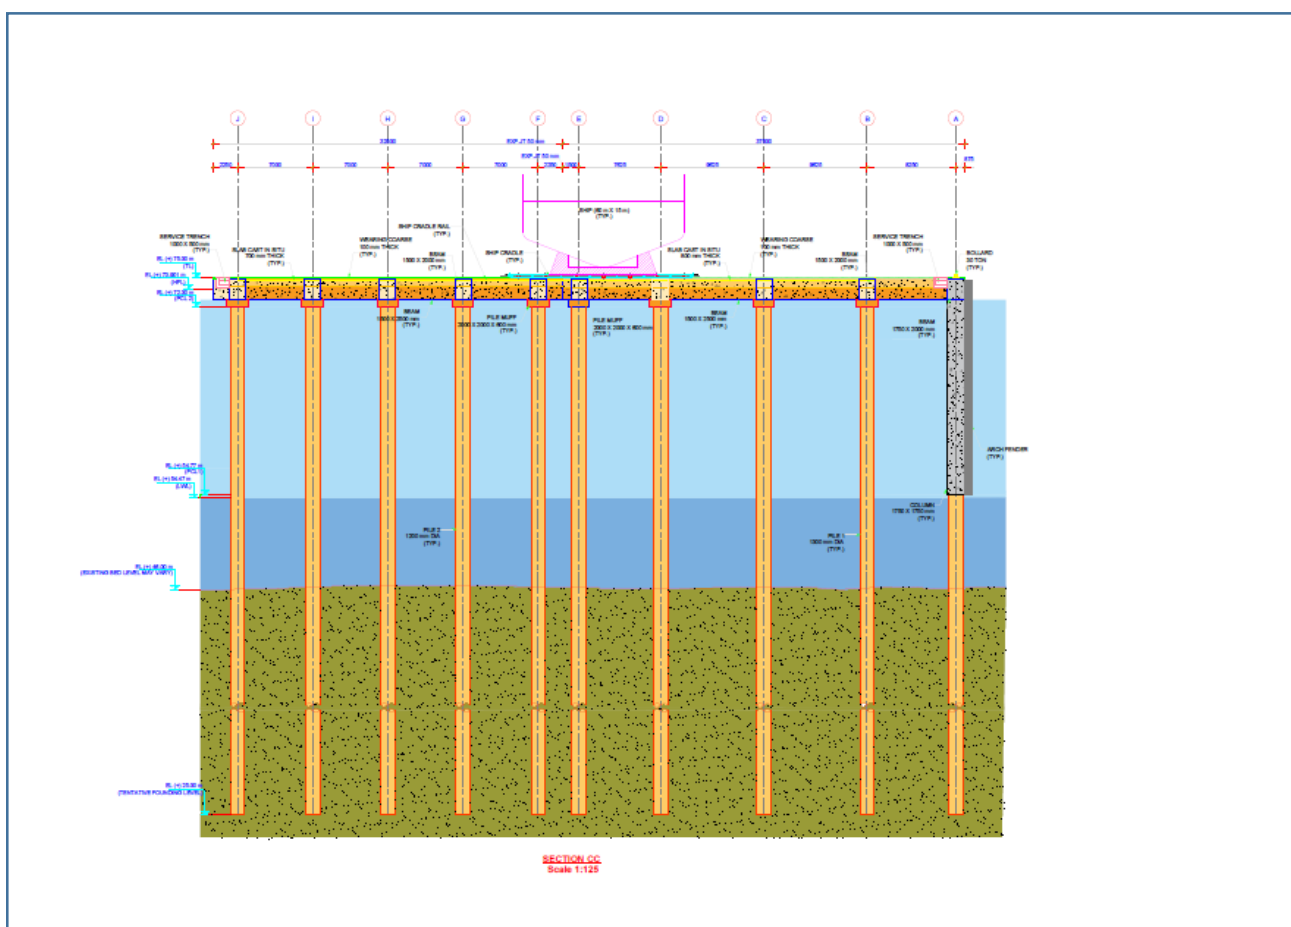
5 Cross-Section of Transfer Bay(Section-CC) of Ship Repair Facility in Varanasi
